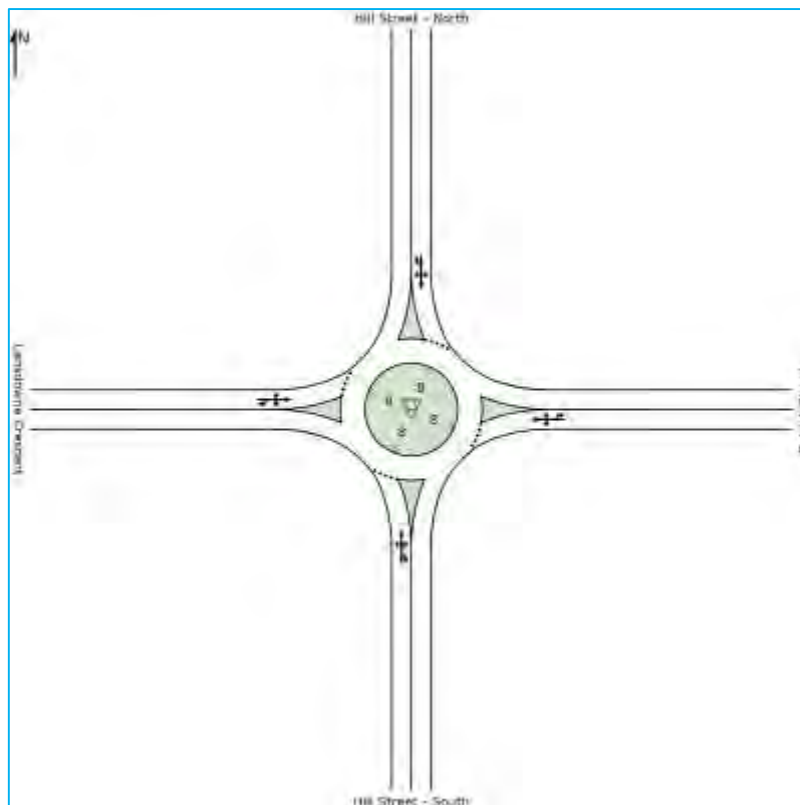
Lansdowne Crescent, Hill Street and Patrick Street Intersection Layout
